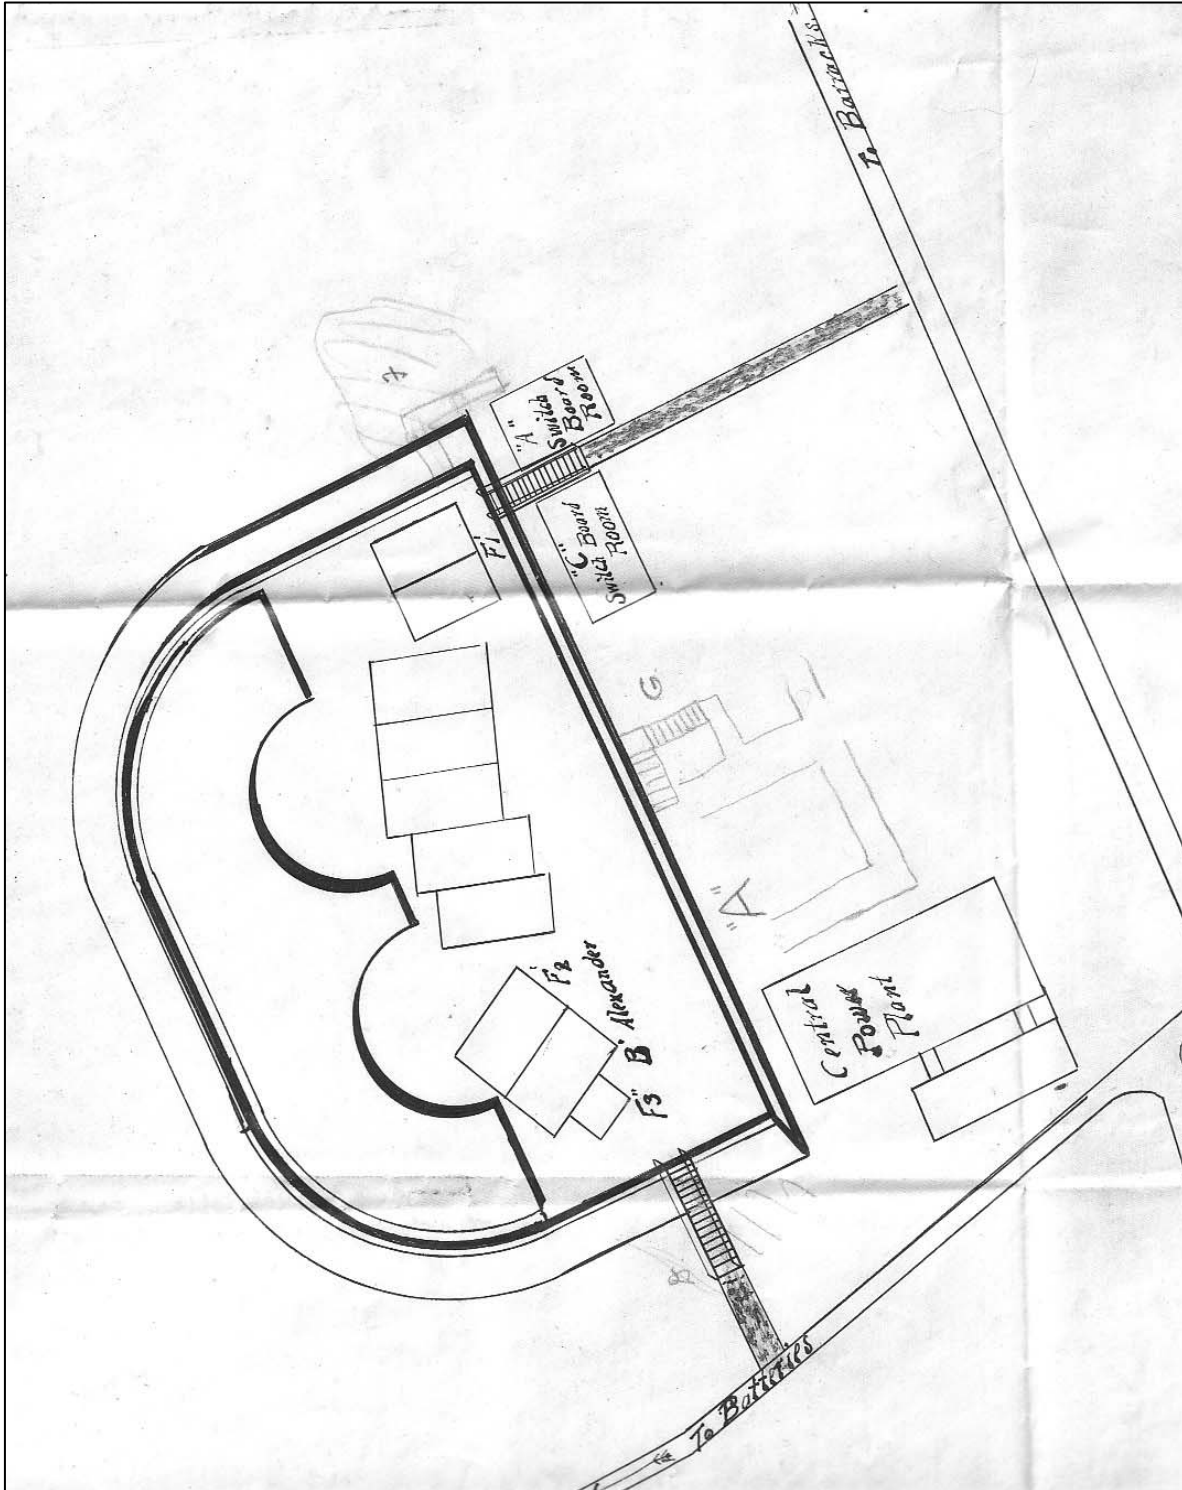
Schematic plan of Battery Potter, showing possible locations for exterior stairways and fire-control stations (1914).
